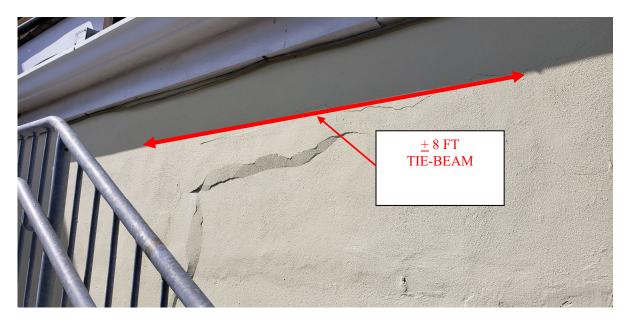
A. Between Location 21 and Location 22. Approximately 12 ft long new 8x16 horizontal tie-beam. See detail 5/S104.
